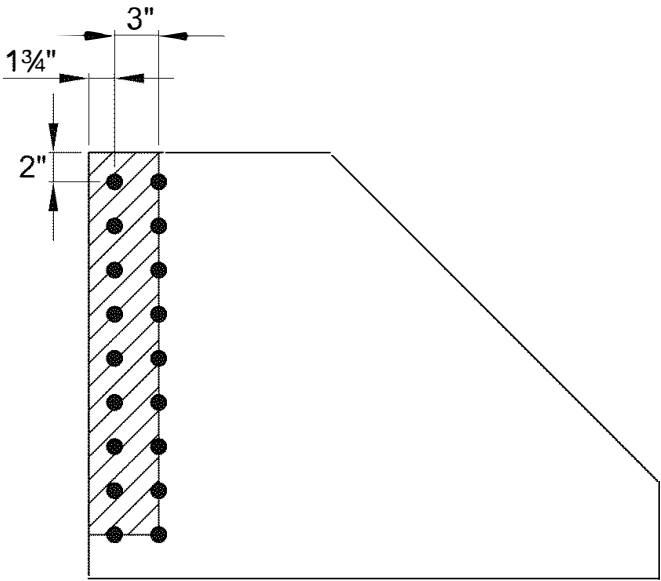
Controlling block shear failure path in gusset plate.
